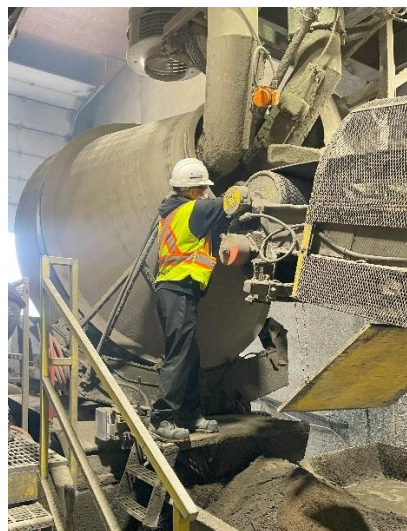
Concrete mixing infrastructure at BPD L Saint-Eugène
